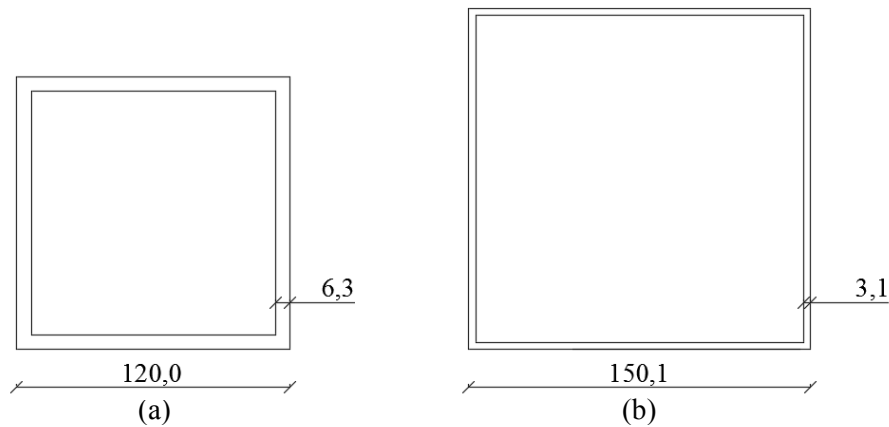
Cross section of existing S355 column (a) and the optimized cross section regarding steel area made of S690 steel (b). The cross sections regards the column length 4.01 m.
